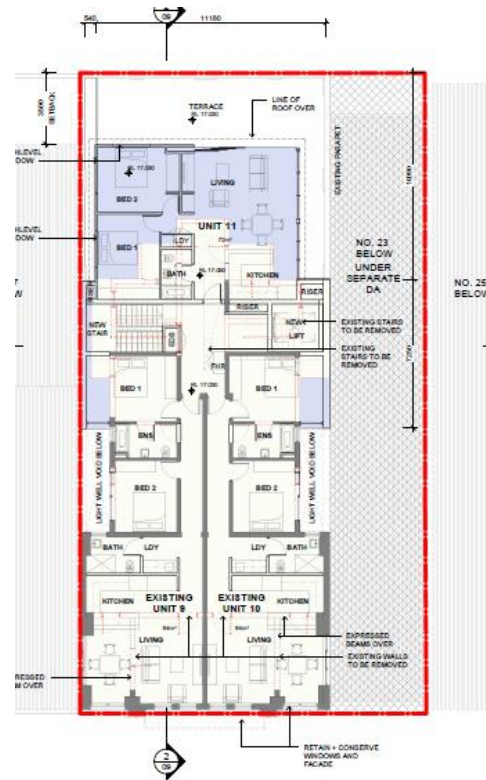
Proposed Third Floor Plan. (Source: NBRSArchitecture)
